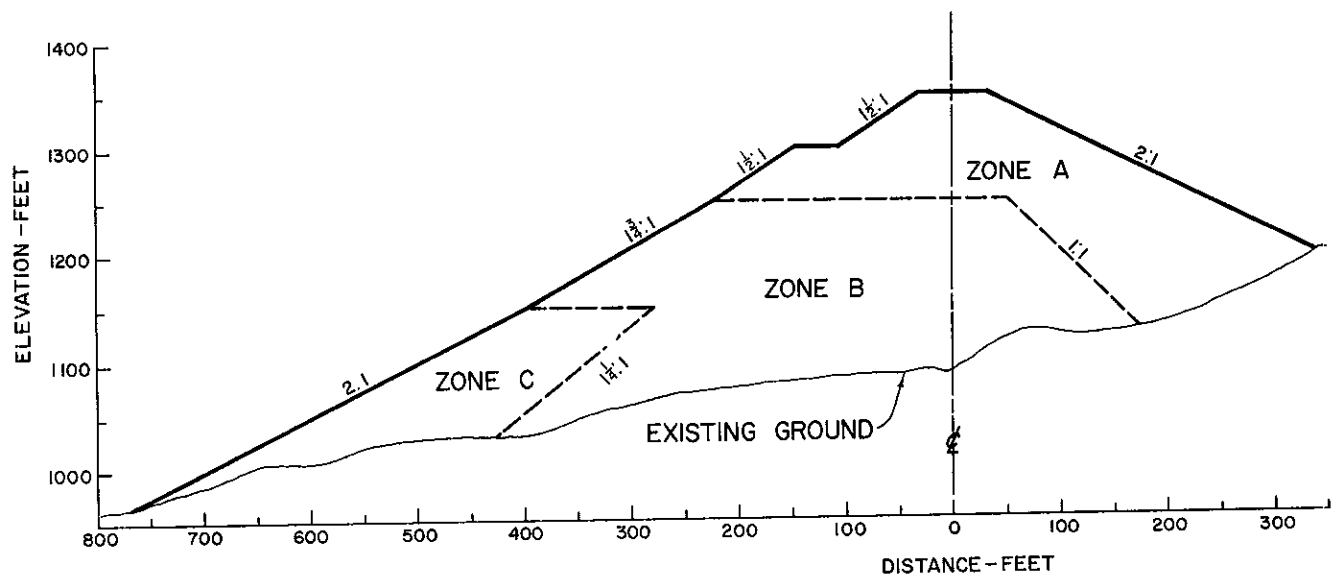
PROPOSED CROSS-SECTION OF EMBANKMENT
